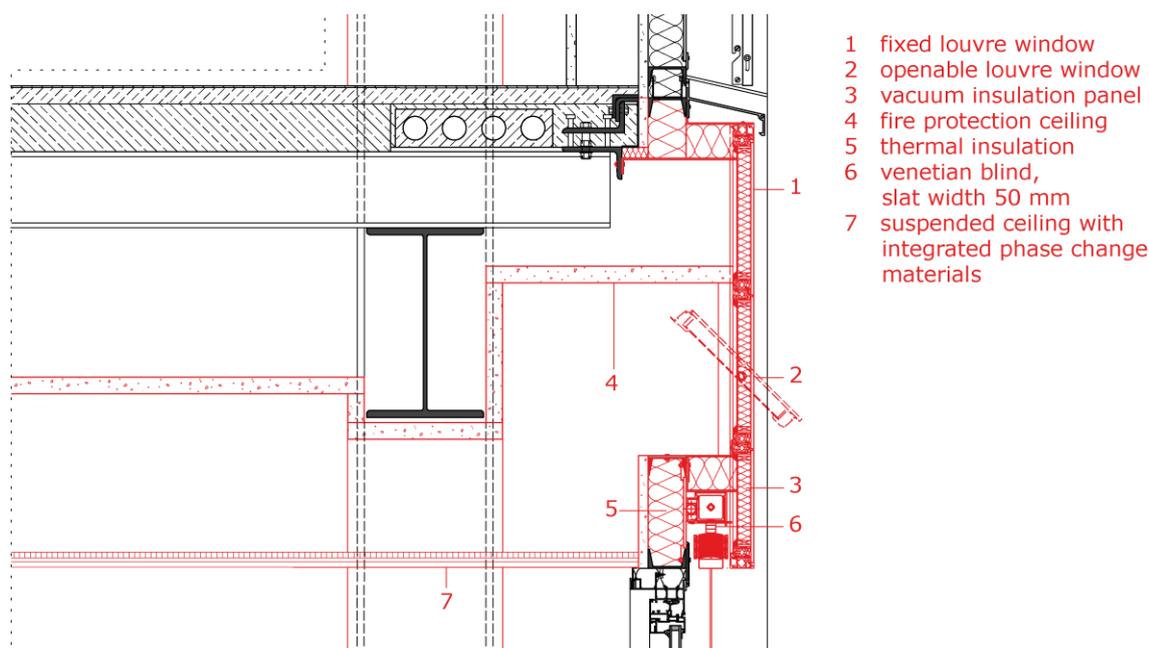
Refurbishment with natural ventilation and intervention in the external façade view.
